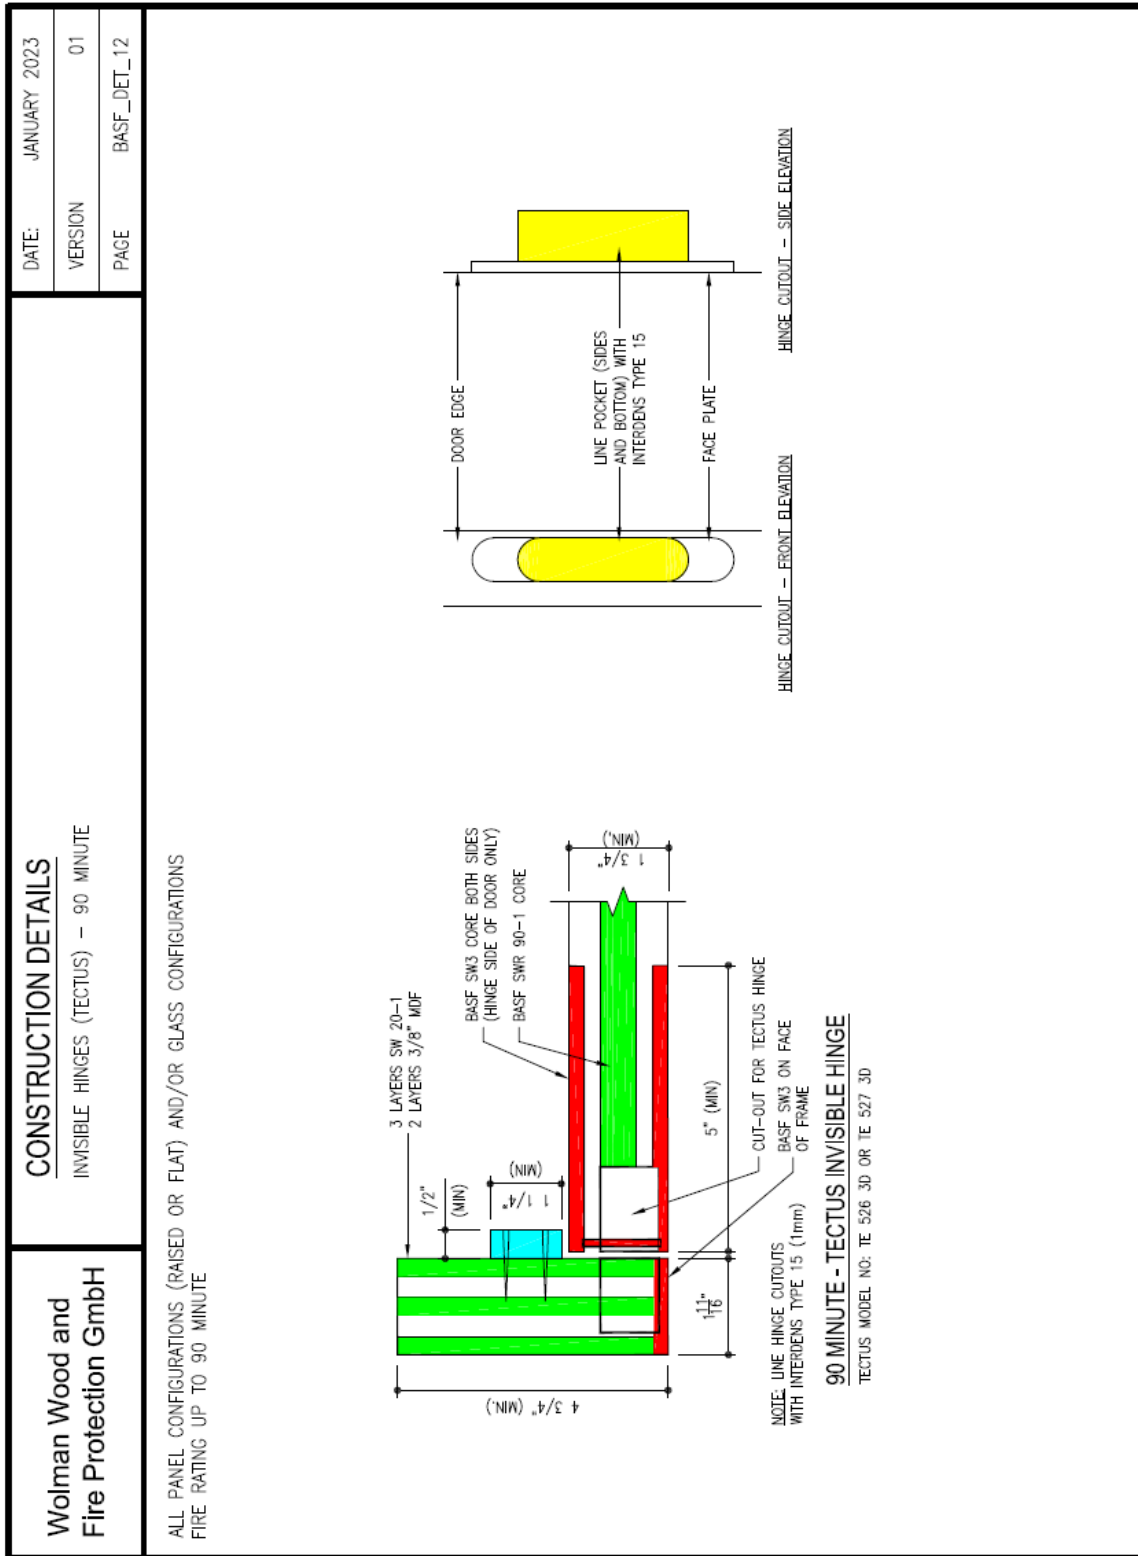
90 minute rated door assembly - concealed hinge detail.
